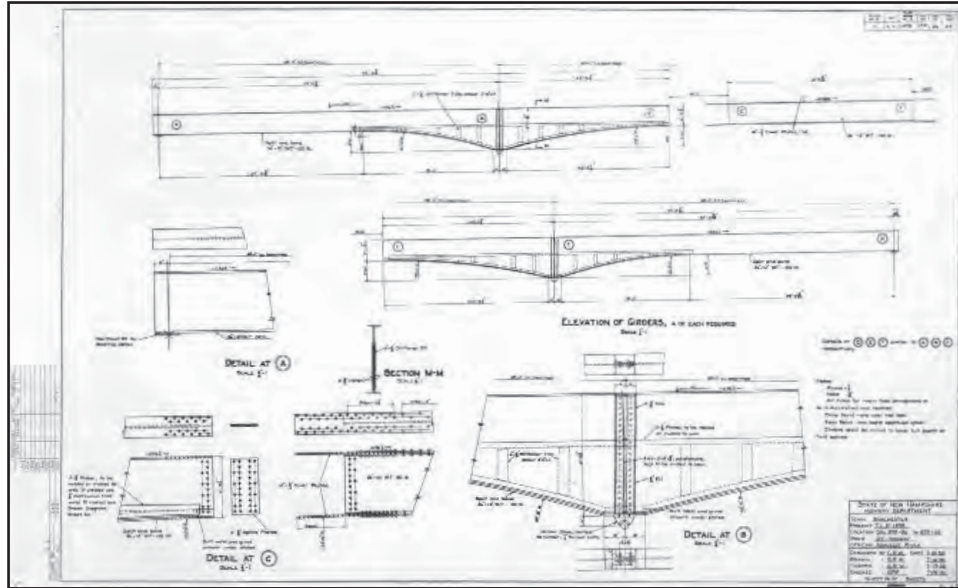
Elevation of Girders and Details (Sheet 26), Winchester-Swanzey Bridge, State Bridge No. 152/181, State of New Hampshire Highway Department. 1935. Plan designed, drawn and traced by GRW [Gordon R. Whittum].
